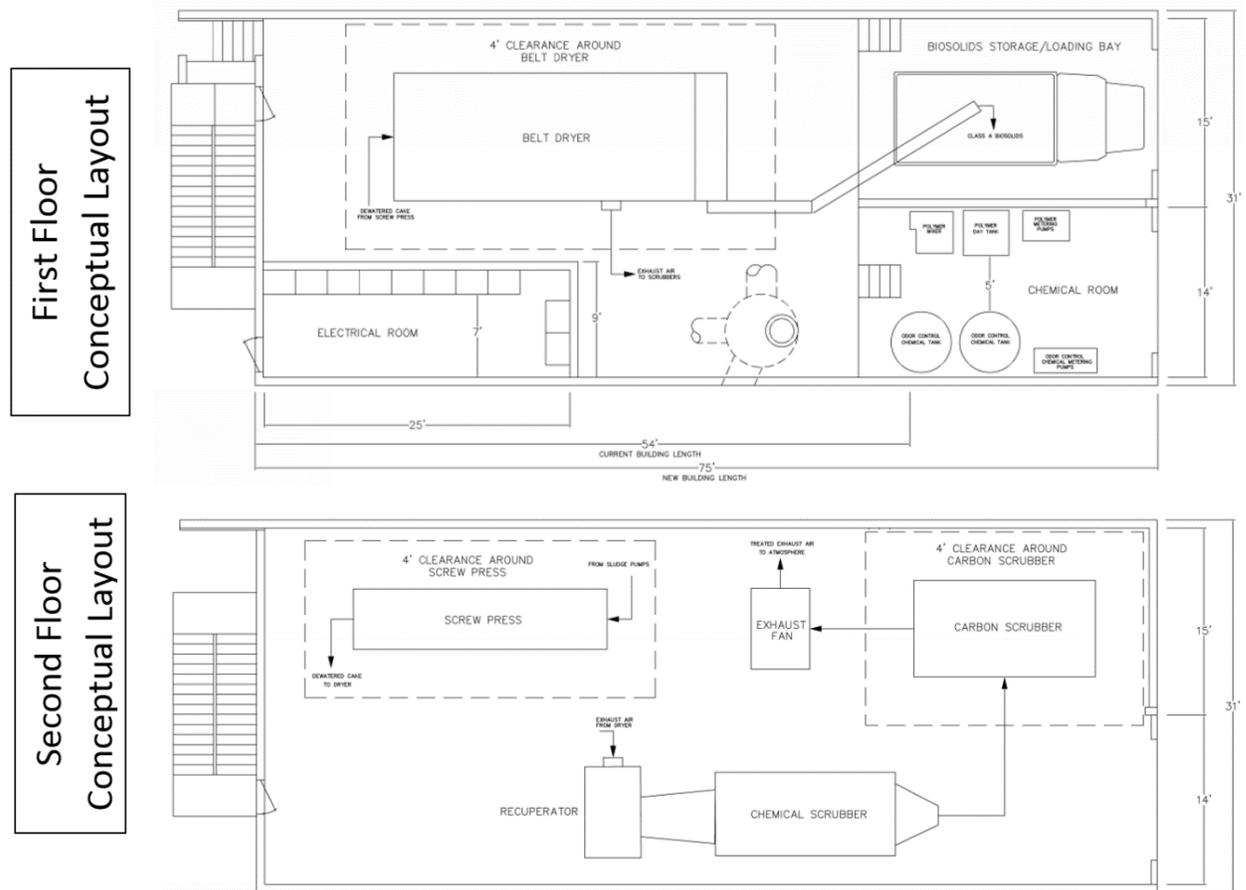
First and Second Floor Conceptual Layouts of Equipment for Class A Solids Treatment and Handling Upgrades
